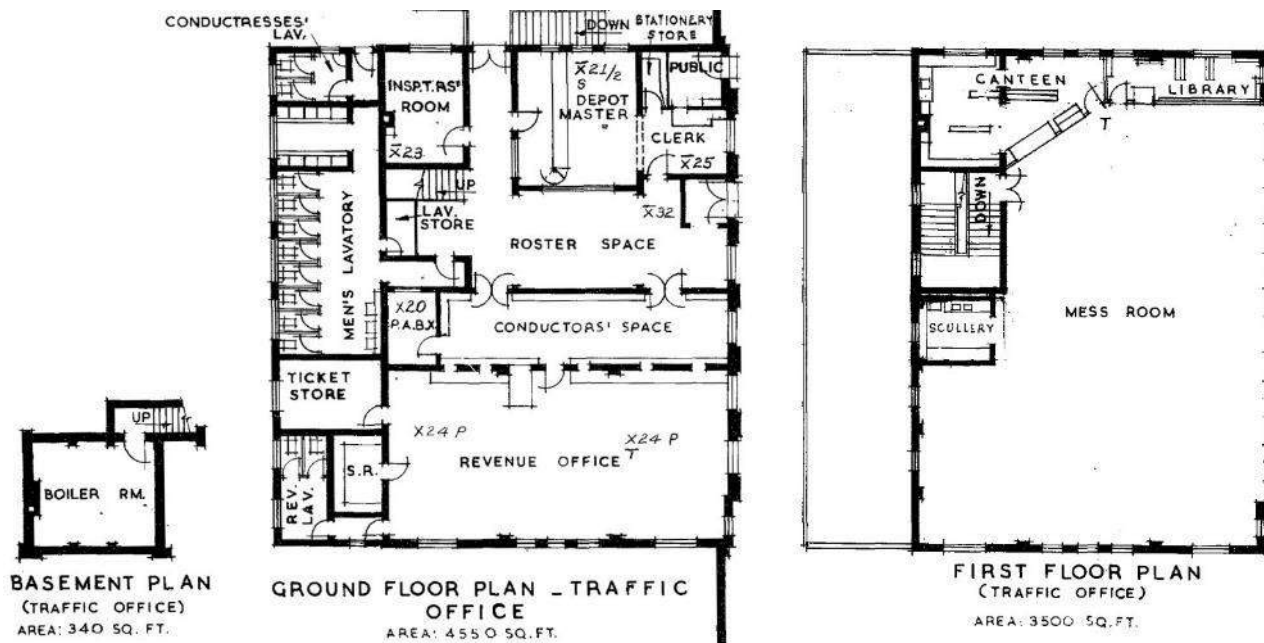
Detail of the basement, ground and first floor floorplans from the MMTB's 1972 plan
